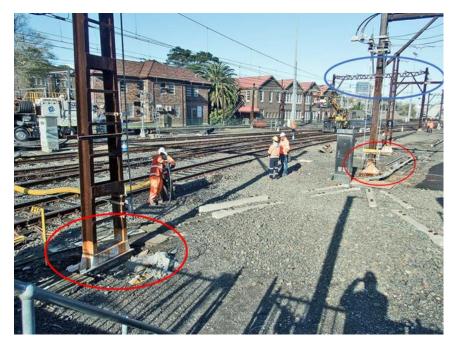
View from Platforms 10 & 11 showing older overhead wiring structures (blue circle) and the variety of concrete footings (red circle). Source: Artefact, 2018.
